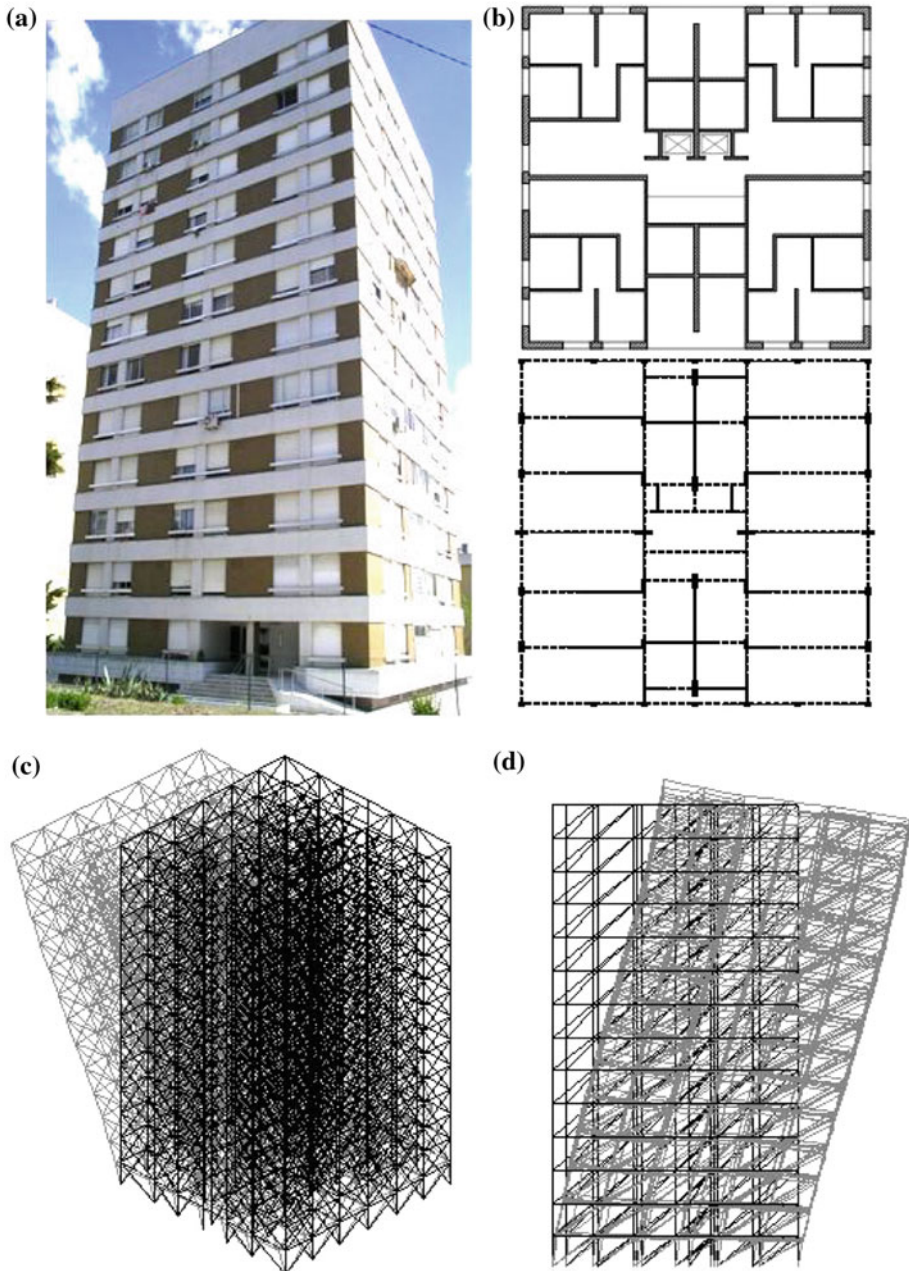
Portela building: a view; b plan and c and d 3-D analytical model with fundamental modes
